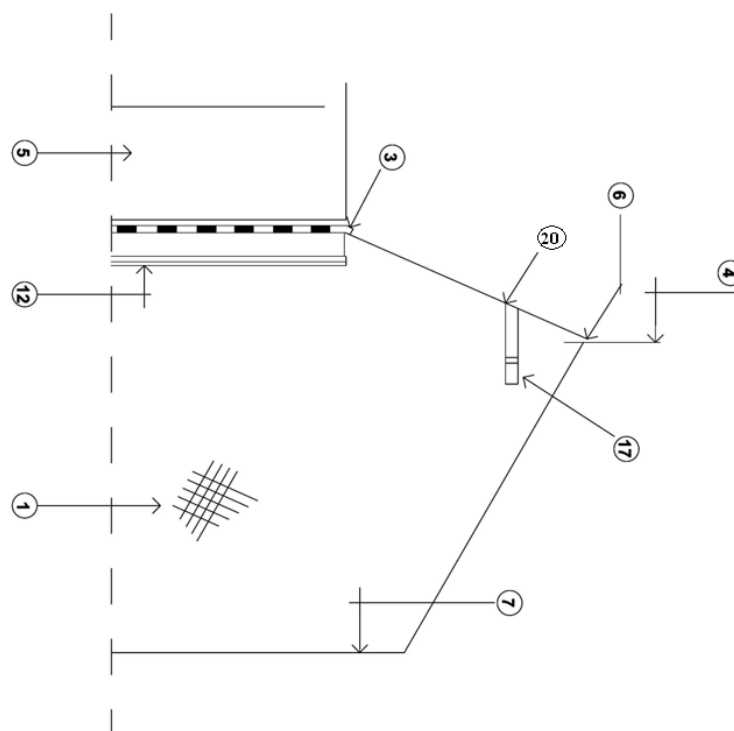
Normal Rect. Stone Retaining Wall Section
